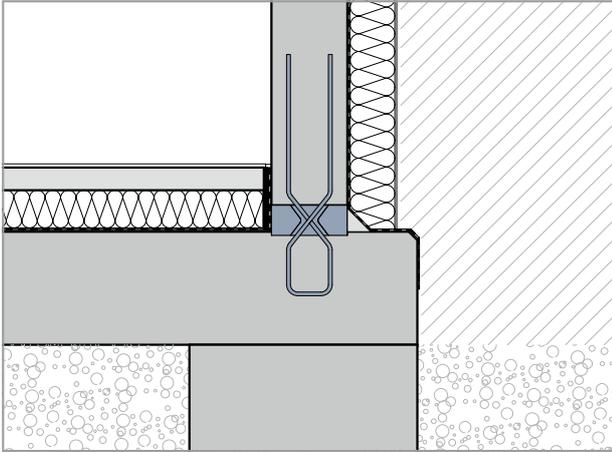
Schöck Sconnex® type W external wall on strip footing/frost-proof course
